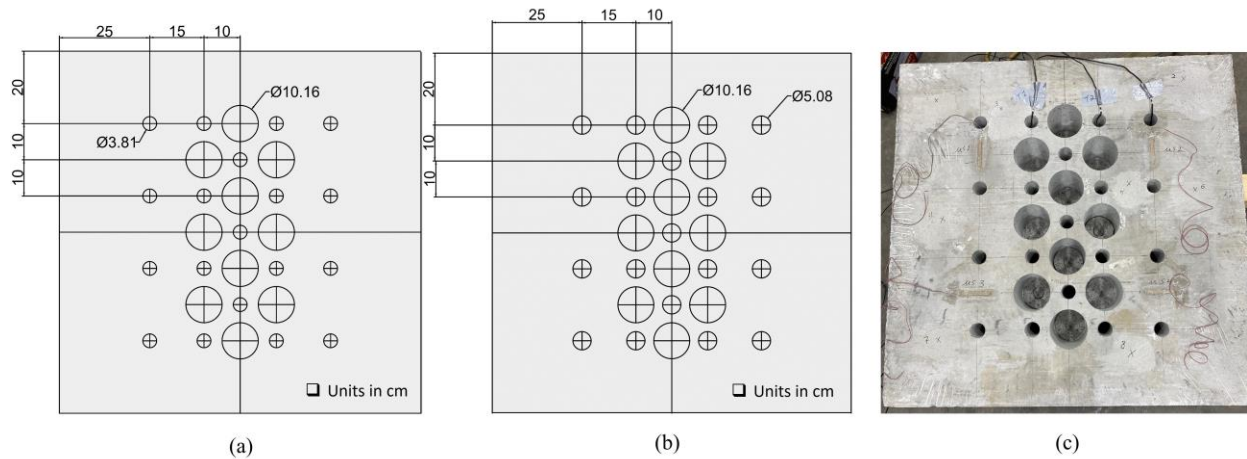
Panel drilling design. a) Concrete panel b) Granite panel c) Photograph of the drilled concrete panel.
